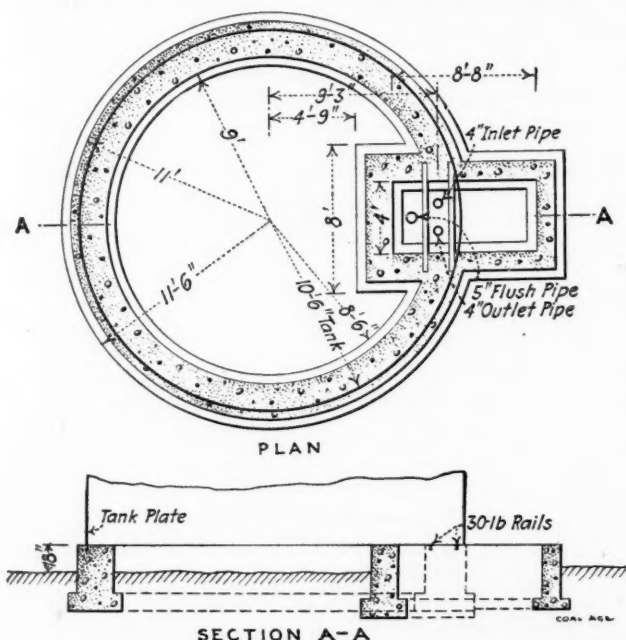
PLAN AND SECTION OF SIMPLE FOUNDATION FOR A SINGLE STEEL TANK
